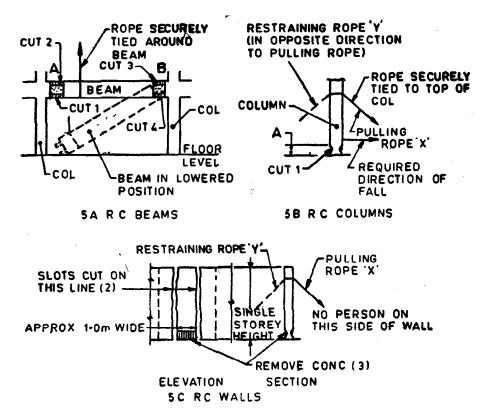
HAND DEMOLITION OF In-Situ CONCRETE STRUCTURE
